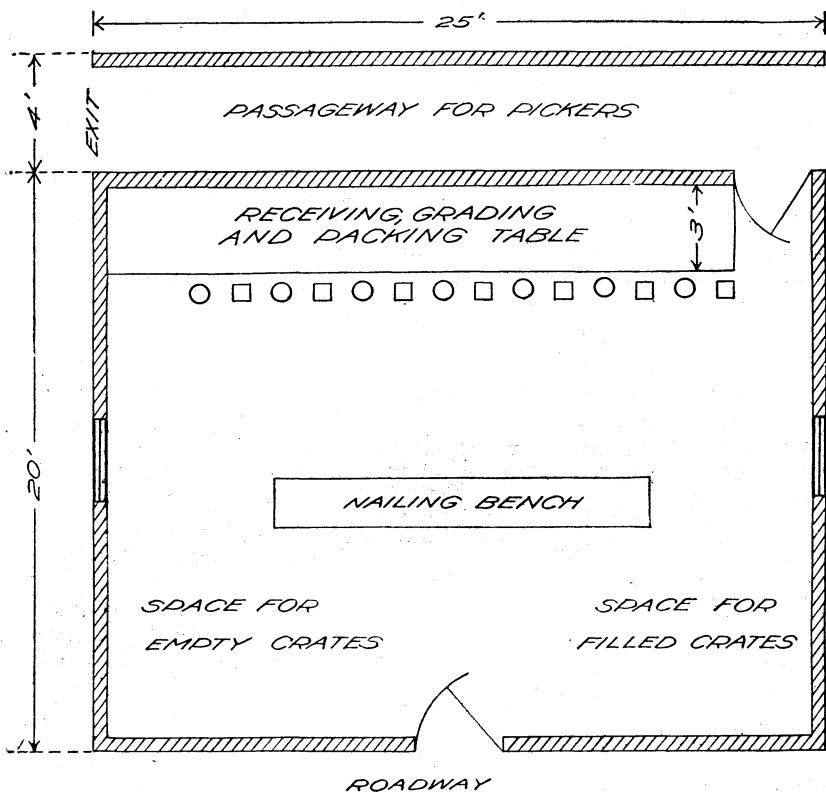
A simple yet satisfactory plan for a strawberry-packing shed.
